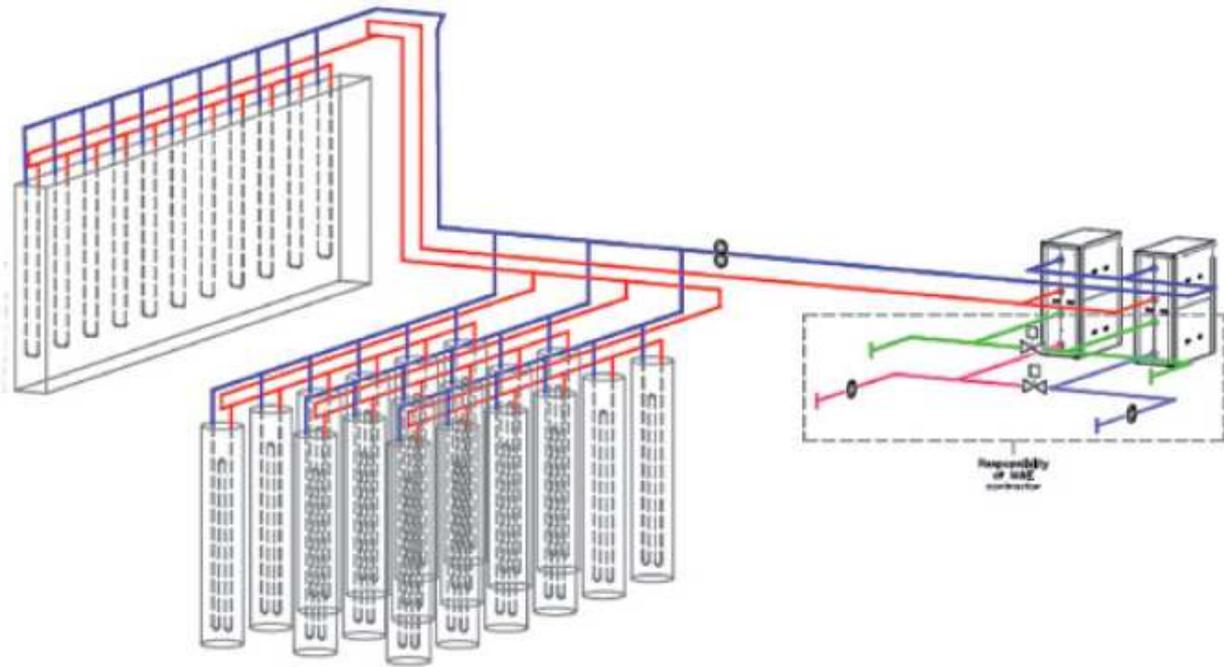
Scheme geothermal plant to “cold foundations” piles, retaining walls.
